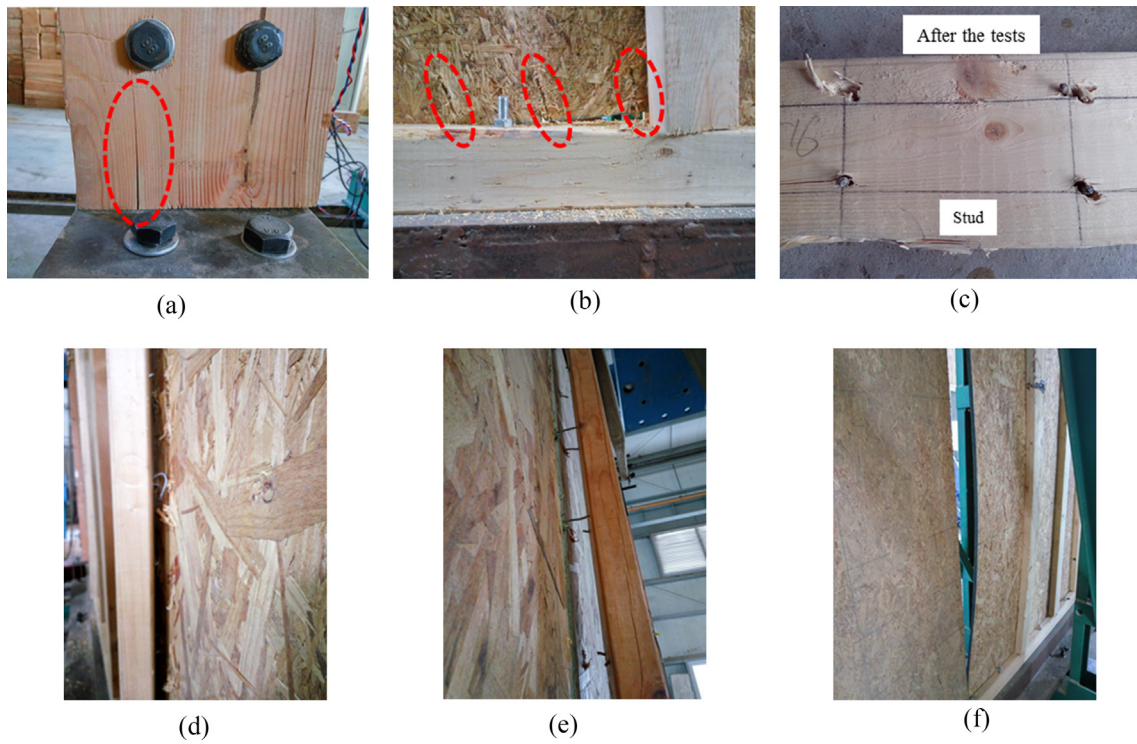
Failure modes: (a) cleavage crack at the bottom of the frame column; (b) nail tear out failure; (c) nail fatigue fracture; (d) nail withdrawal; (e) detachment of the intermediate studs at the panel joints; (f) buckling of the mid-sheathing panel.
